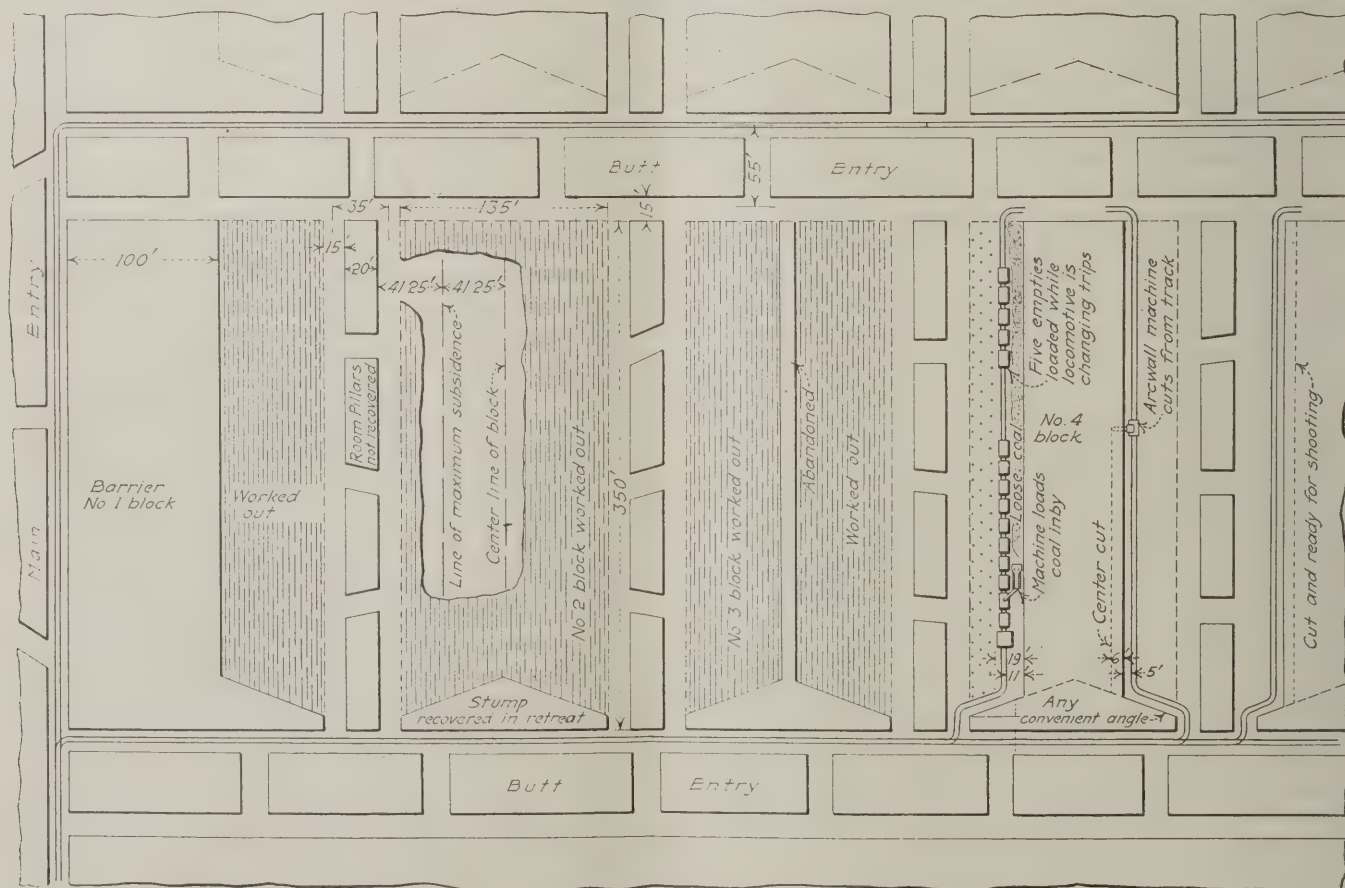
Double-Room System of Modified Longwall Advancing Used in Gay Mine
